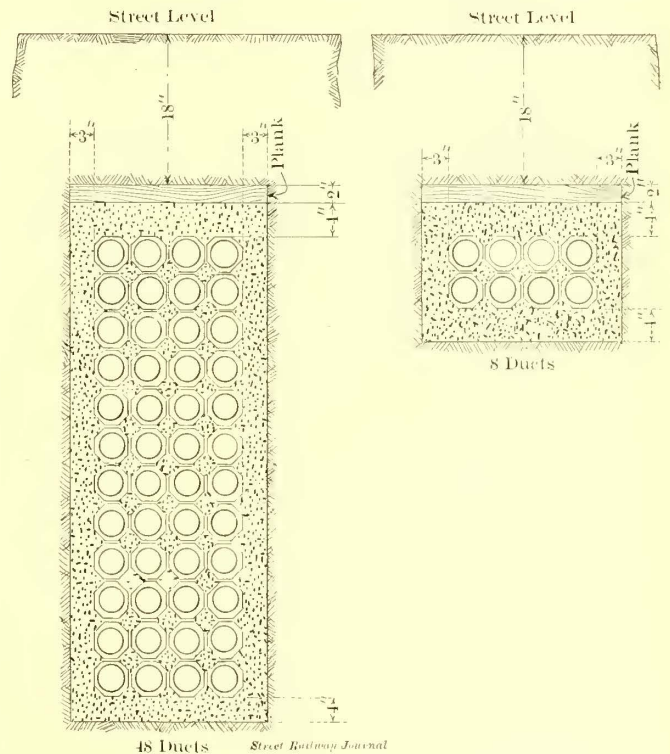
SECTIONS OF UNDERGROUND CONDUITS
